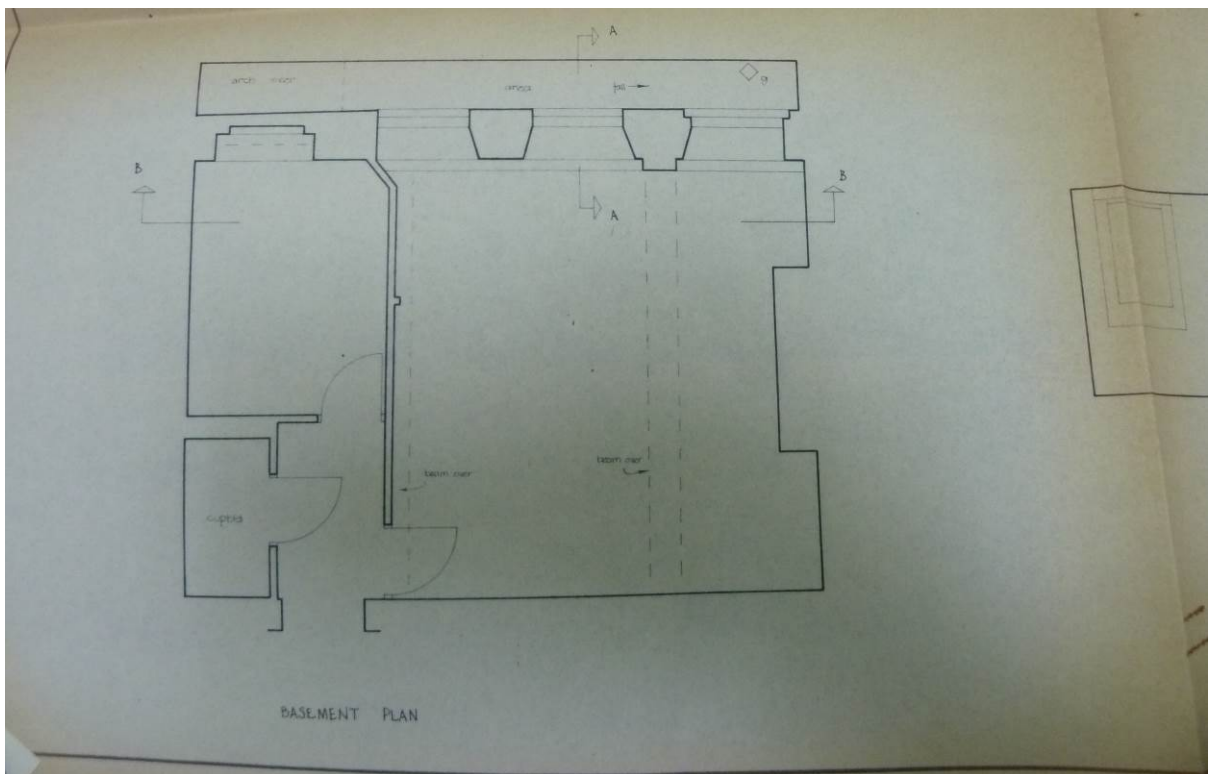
The front basement room as existing in 1975, Cuthbert Lake & Clapham (LB Camden, planning file)
